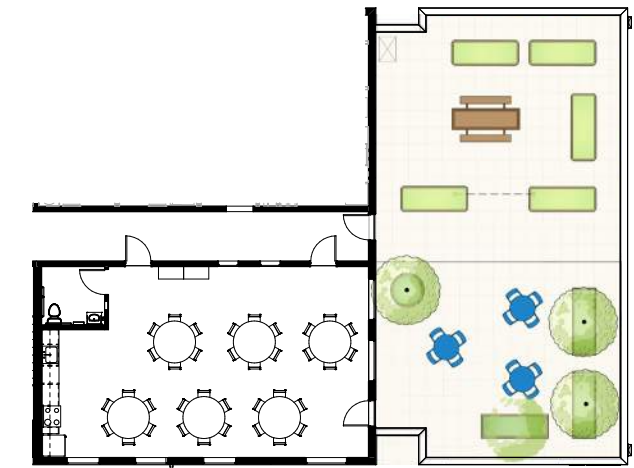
Level 2 Common Room & Courtyard Plan
